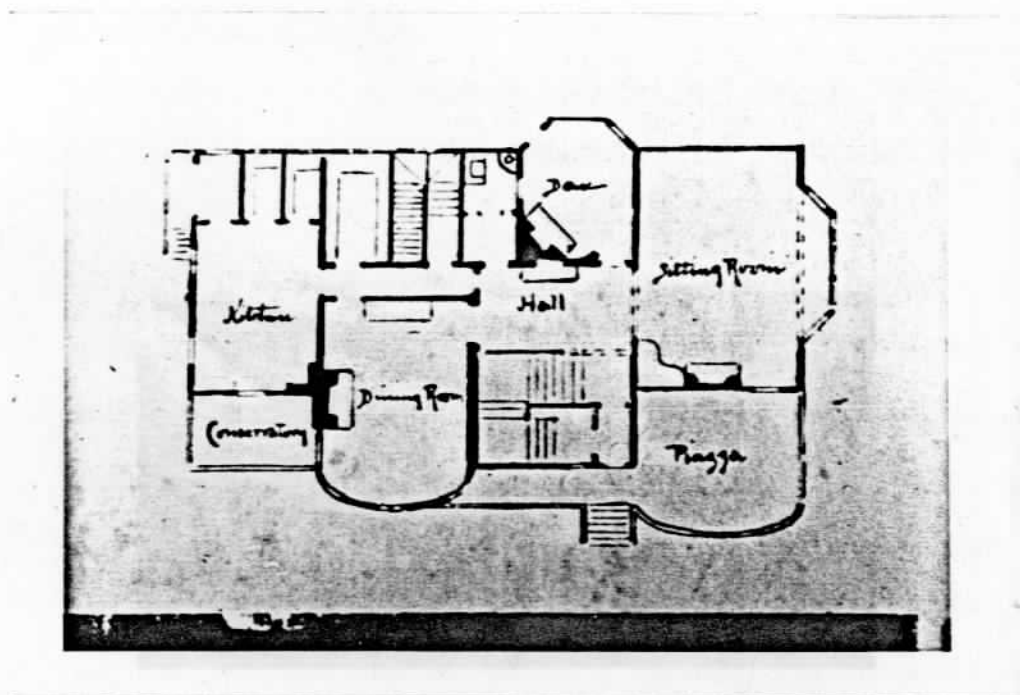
Silsbee, J. L. Silsbee House, Edgewater, Illinois (Chicago), 1888, plan, ground floor (Inland Architect).
